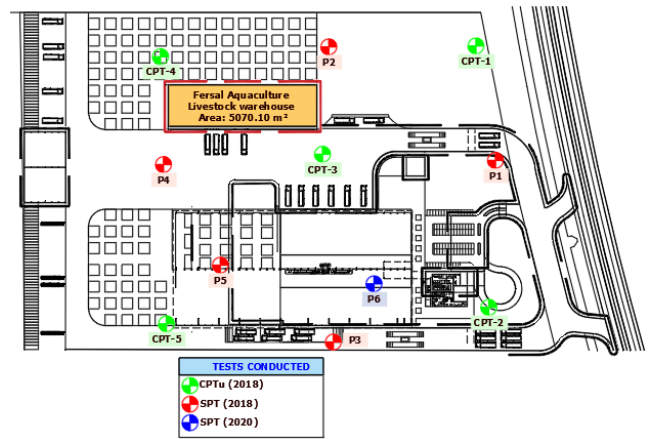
SPT and CPTu test locations performed pre-construction of the warehouse, within the study area
